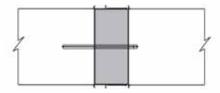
Horizontal damper fitting in the duct- EN 1366-9
